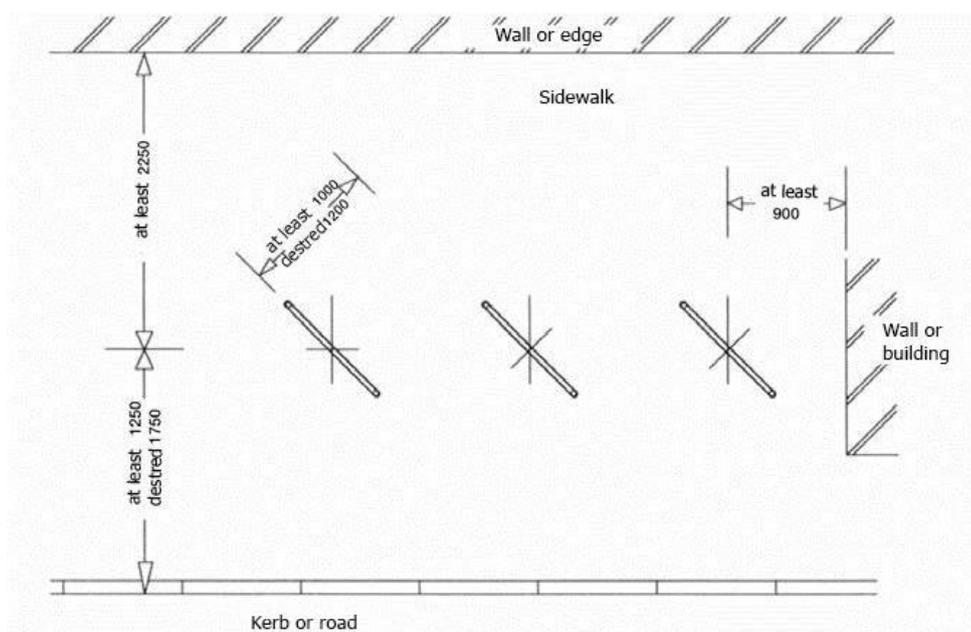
U-shaped rack located at 45 degrees to the curb and the sidewalk
